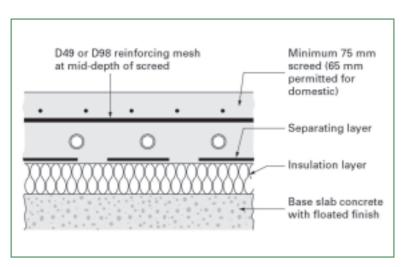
Cement/sand or fine concrete construction. ©The Concrete Society.
